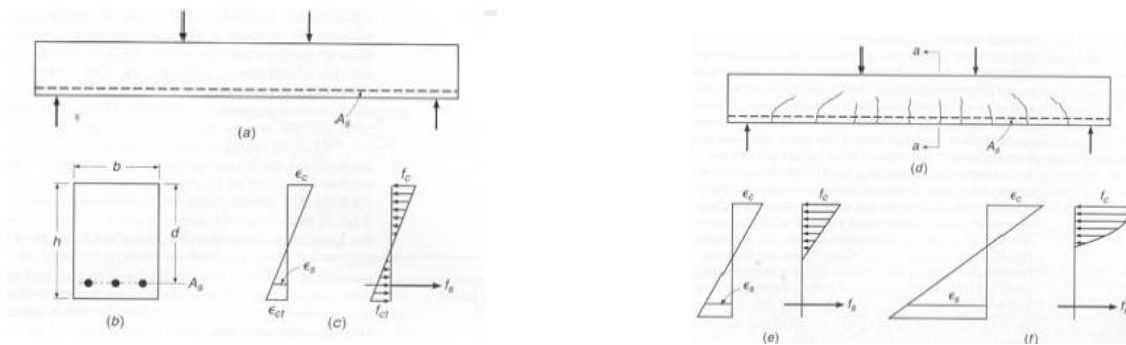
Stress, Strain of uncracked RC beam Figure 2-5: Stress, Strain of cracked RC beam
